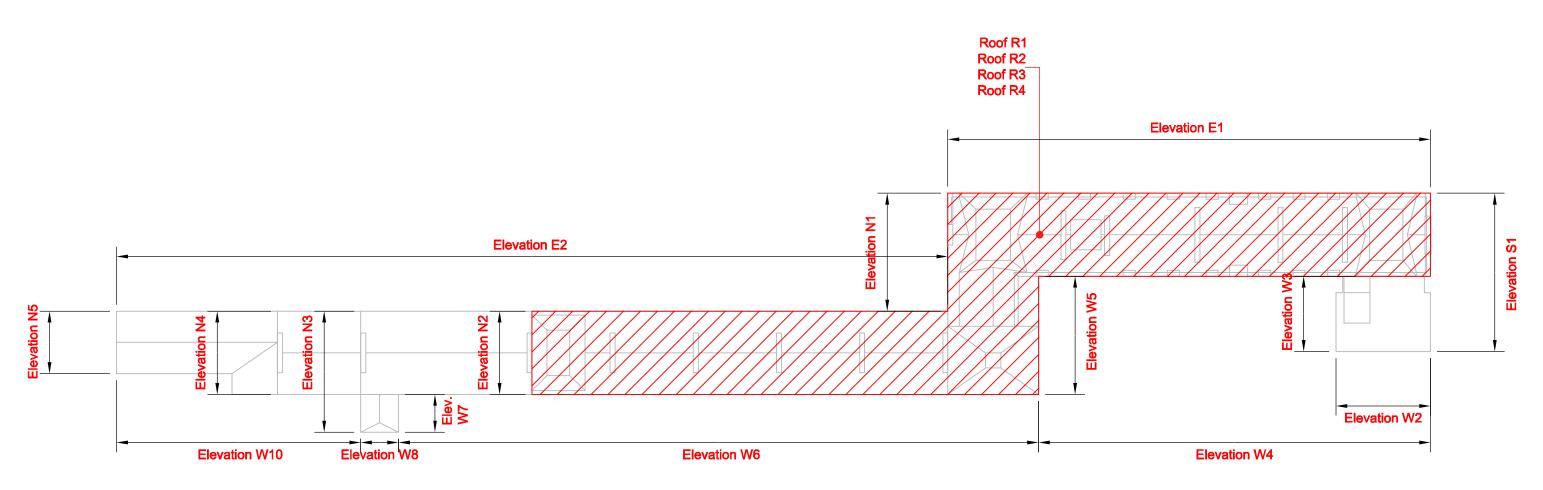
Plan of Station Hotel Building showing Roof and Elevation Location References
